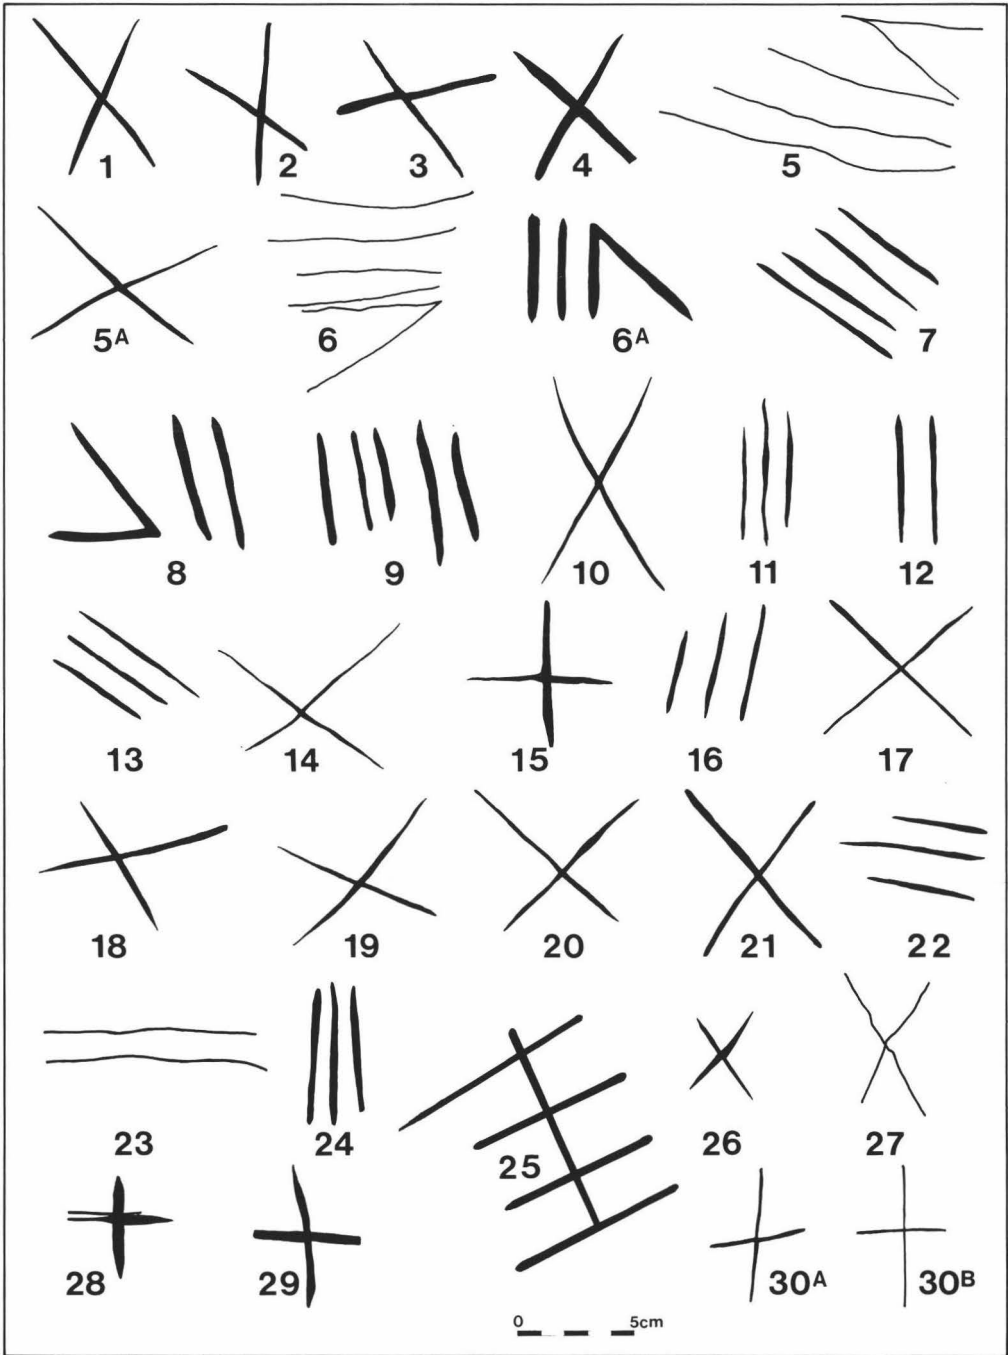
Stone-cutters' marks 1-25 on the ashlar of the walls of building 1. 26-30 on detached stonework.
